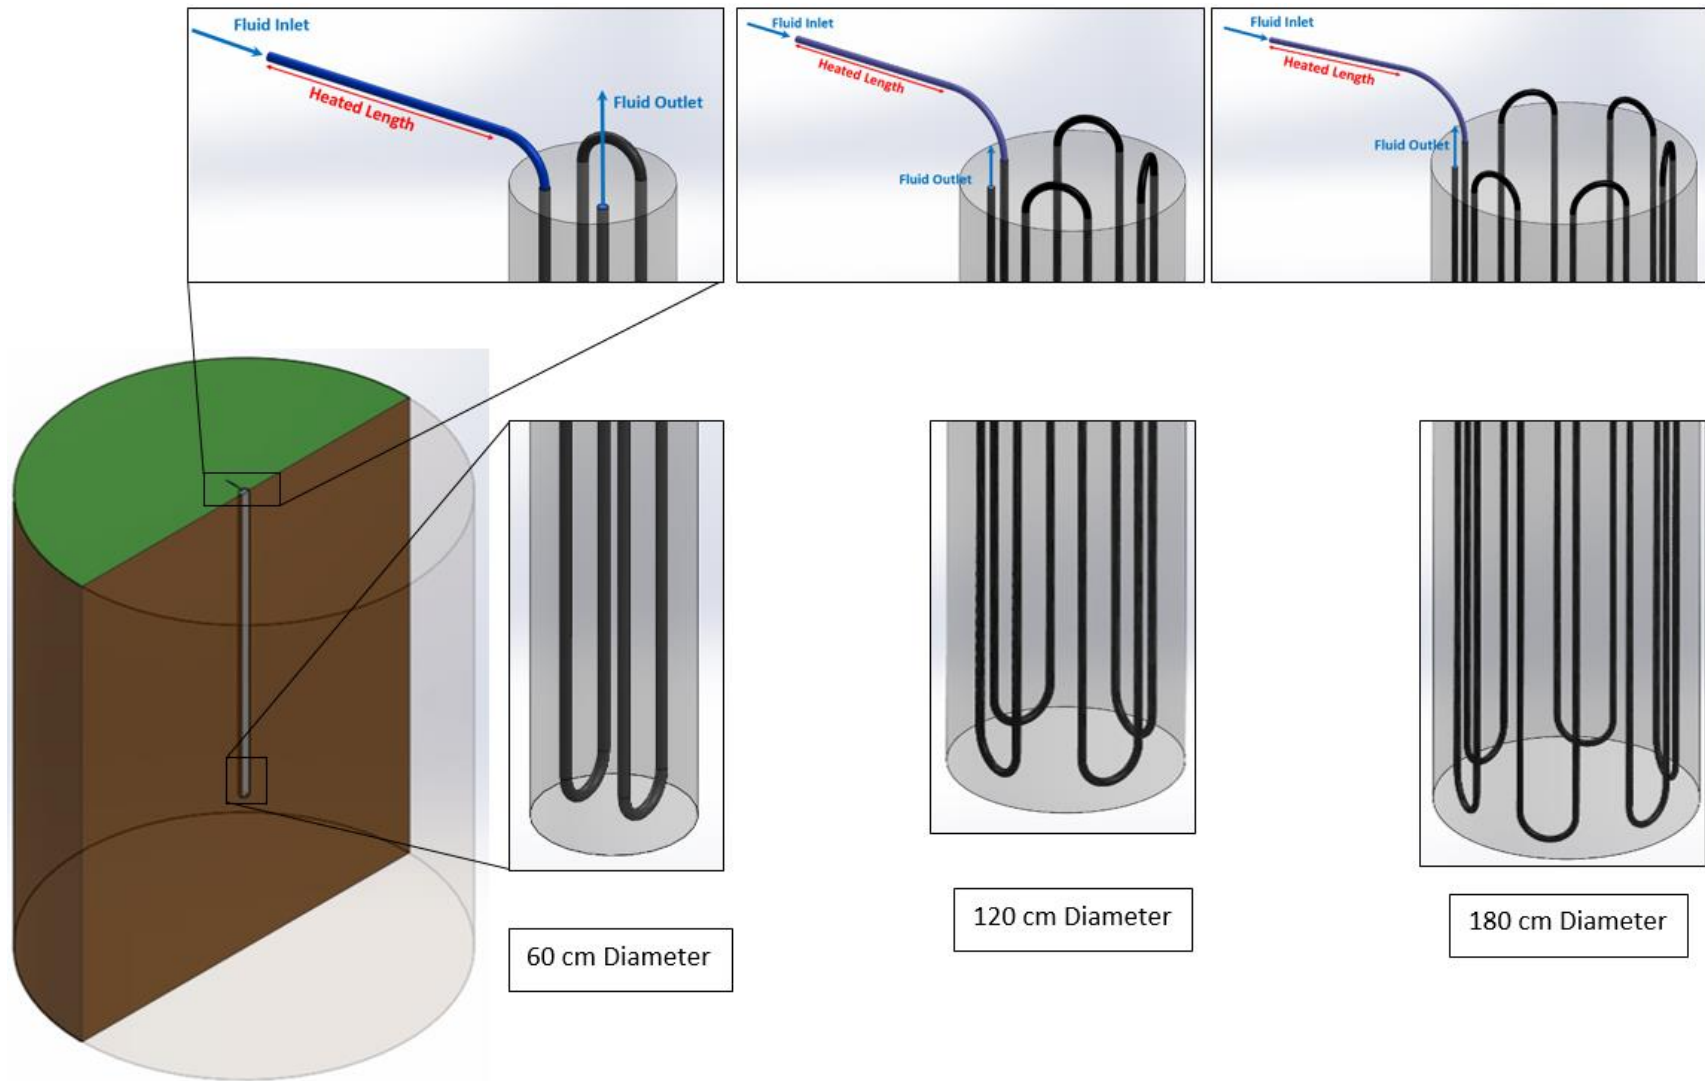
The geometry of the 60cm, 120cm, and 180cm piles with enlarged sections of the top and bottom of the piles.
